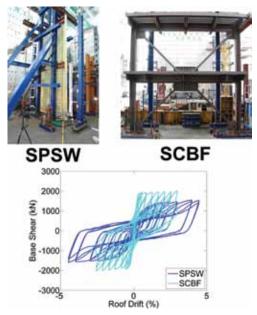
Large-scale SPSW and SCBF test specimens and hysteretic behavior. Courtesy of K.C. Tsai and NEESHub.
